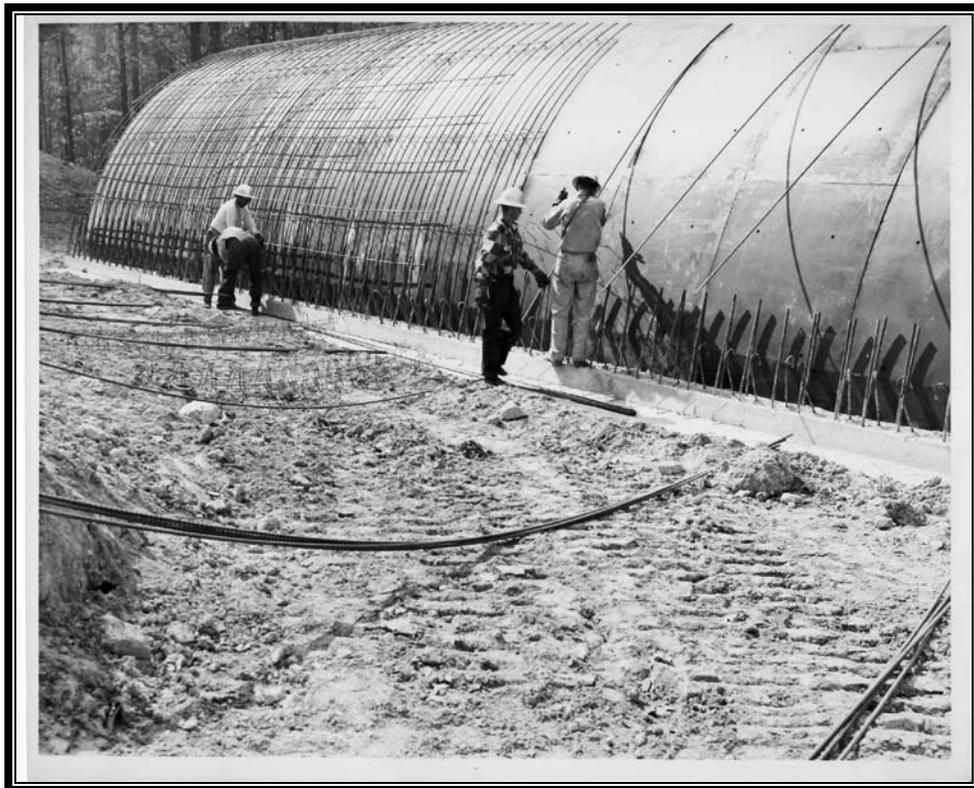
New igloo storage under construction with inner form in place and installation of reinforcing steel, ca. 1953 (Courtesy U.S. Army)
